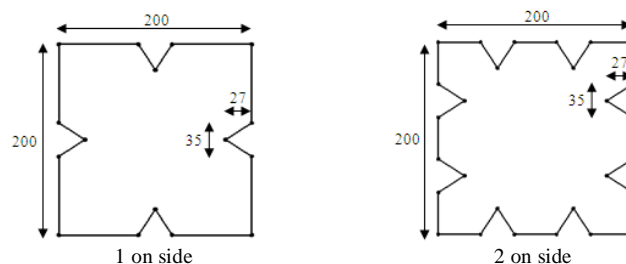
Cross sections of the concrete-filled steel composite columns (Triangular stiffeners & cold-formed steel sheets of 1.5, 1.75 & 2 mm)
